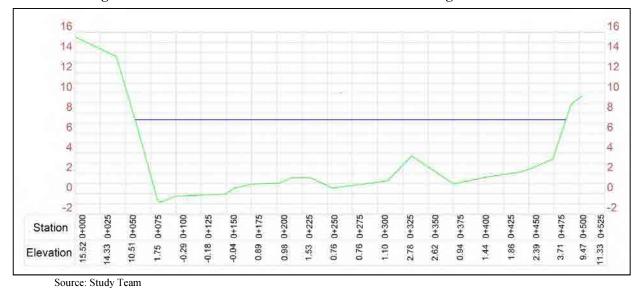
River Cross Section of the Alternative Bridge Locations B-2
